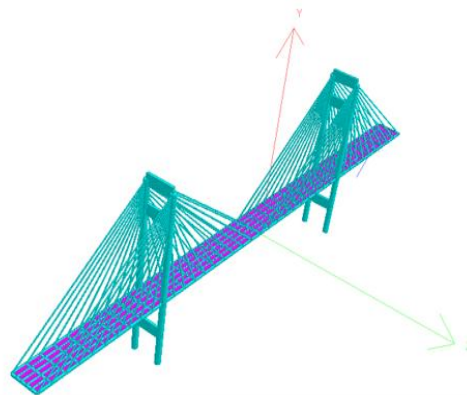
Box A-Shaped Pylon Cable-Stayed Bridge
